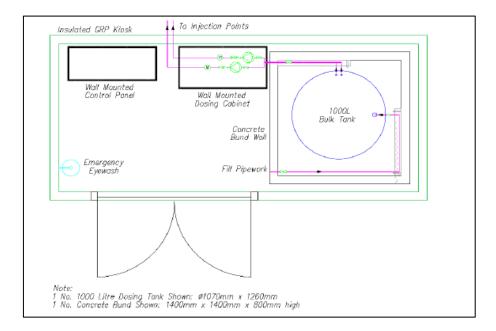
IW schematic of a bulk tank kiosk layout in H3PO4 Installation with 500 litres< bulk storage ≤ 6,000 litres.
